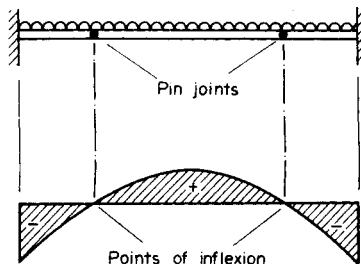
Built-in beam using “double-cantilever” construction.
